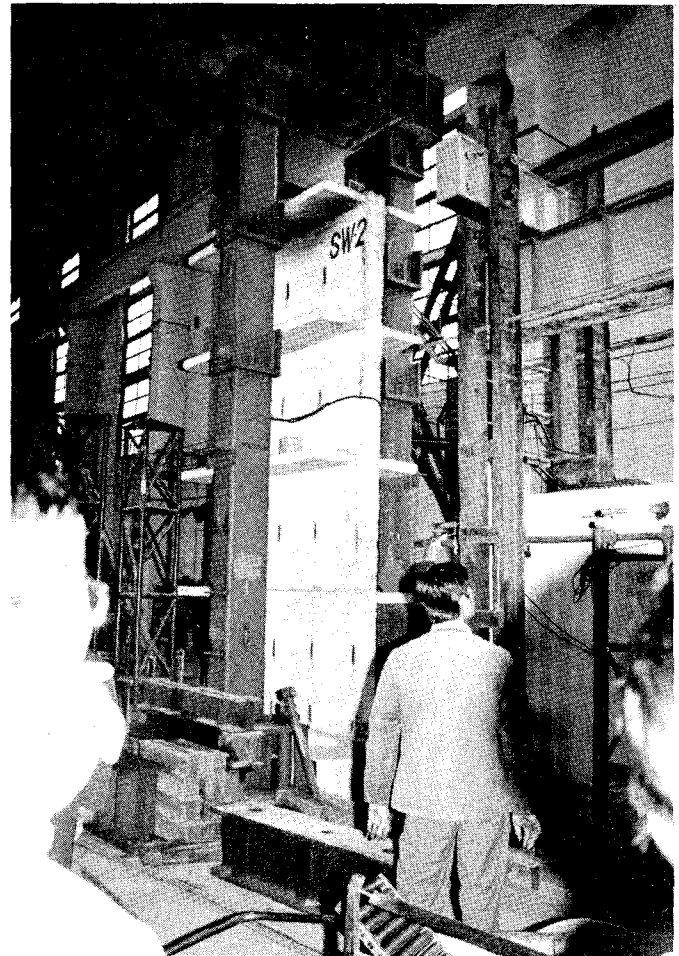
Four-story wall with slab elements at the Academy of Building Research, Beijing.
